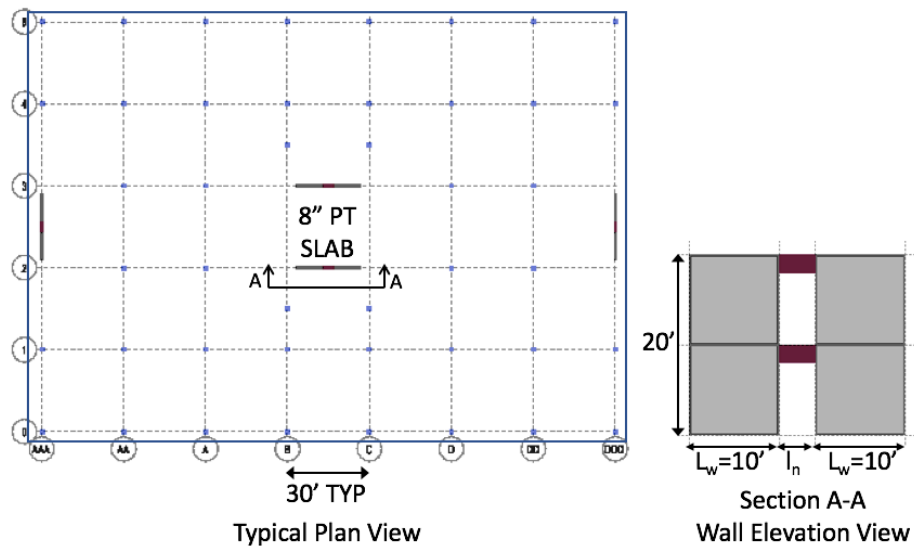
2-Story Archetype Floor Plan and Elevation View
